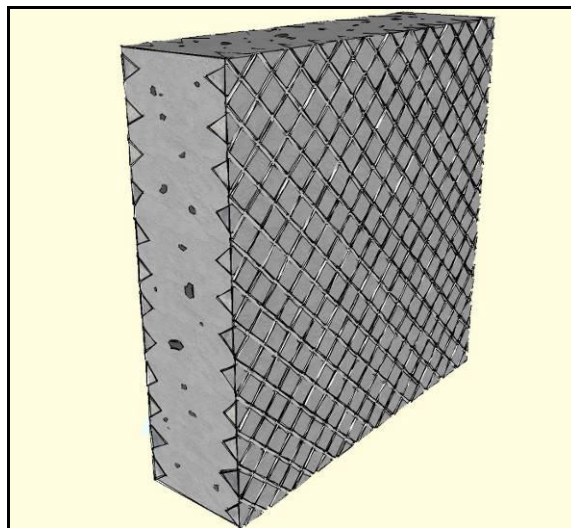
Illustrative drawing of opus reticulatum wall facing
